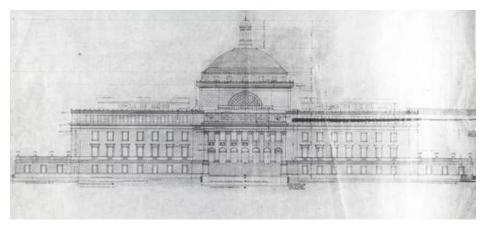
Carmoega and Nichols. South façade, Capitol Building. 14
